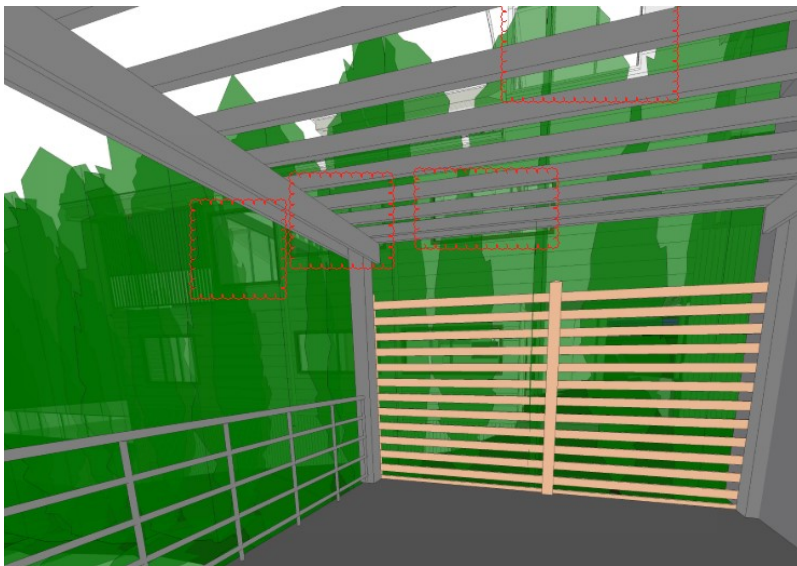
View lines from No. 22 Wandeen Road private open space area toward the window openings which are circled in red. (Source: Rise Projects)
